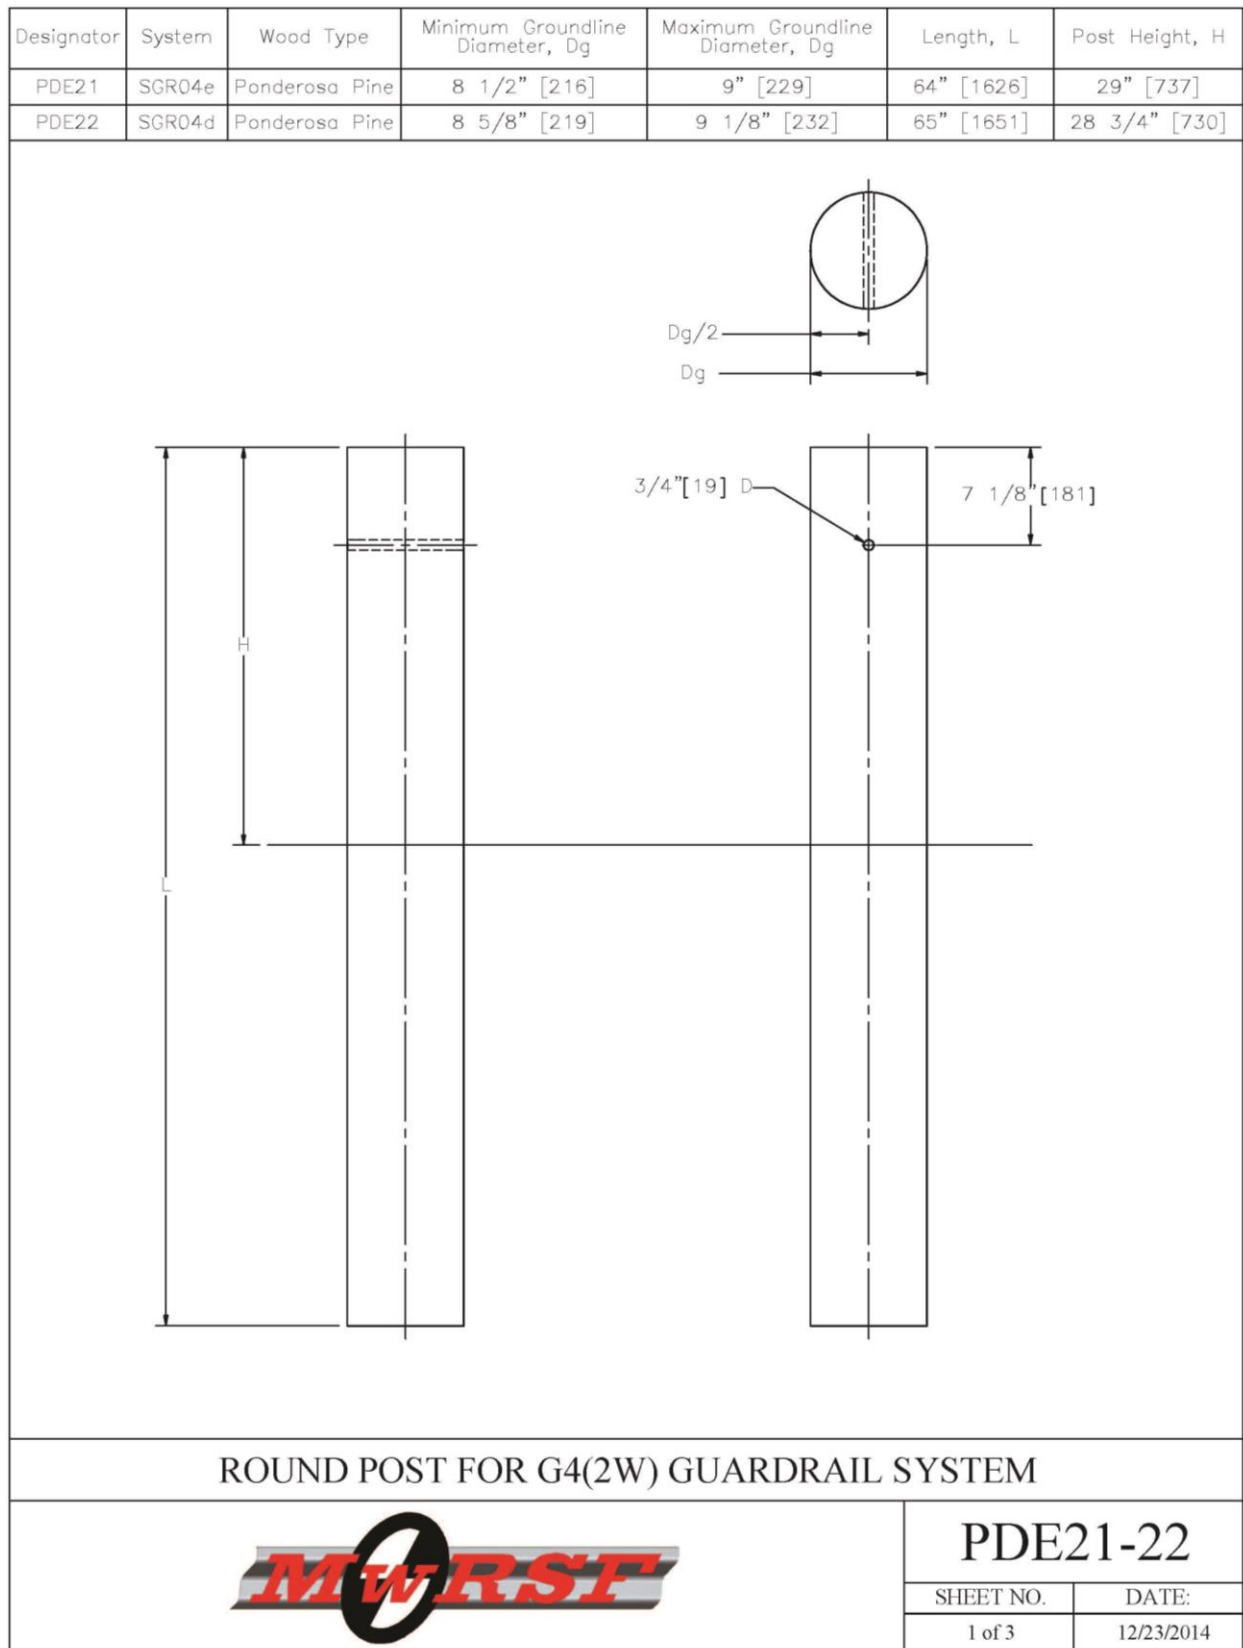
Round Post for G4(2W) Guardrail System, Sheet 1
